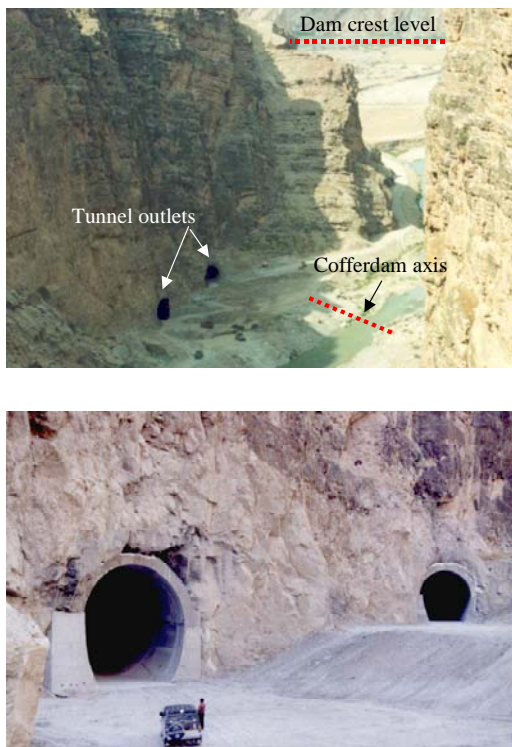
Downstream view of diversion tunnel outlets, general view (above), outlet portals and outlet channel (below)
